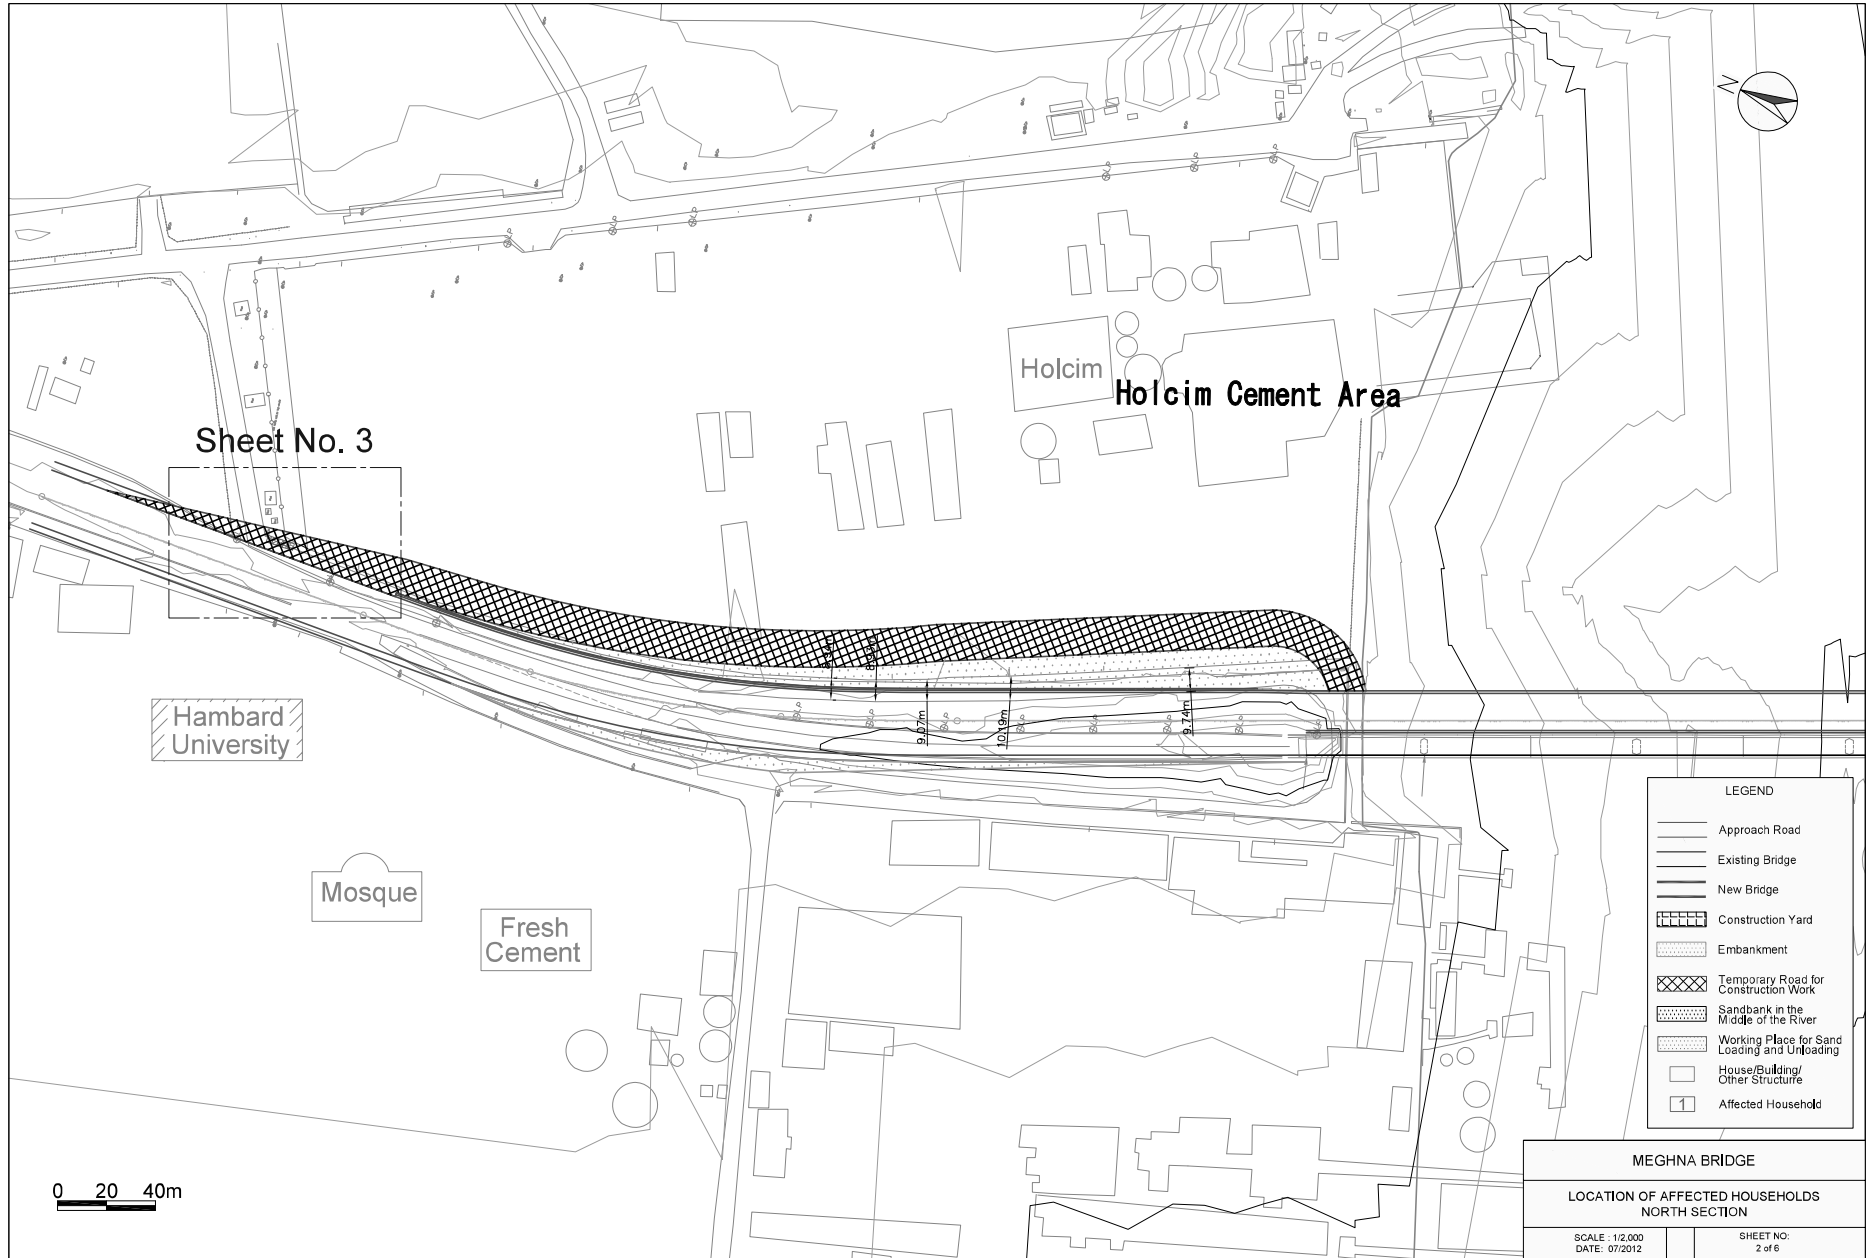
Location of Affected Households North Section (Sheet No.2)
